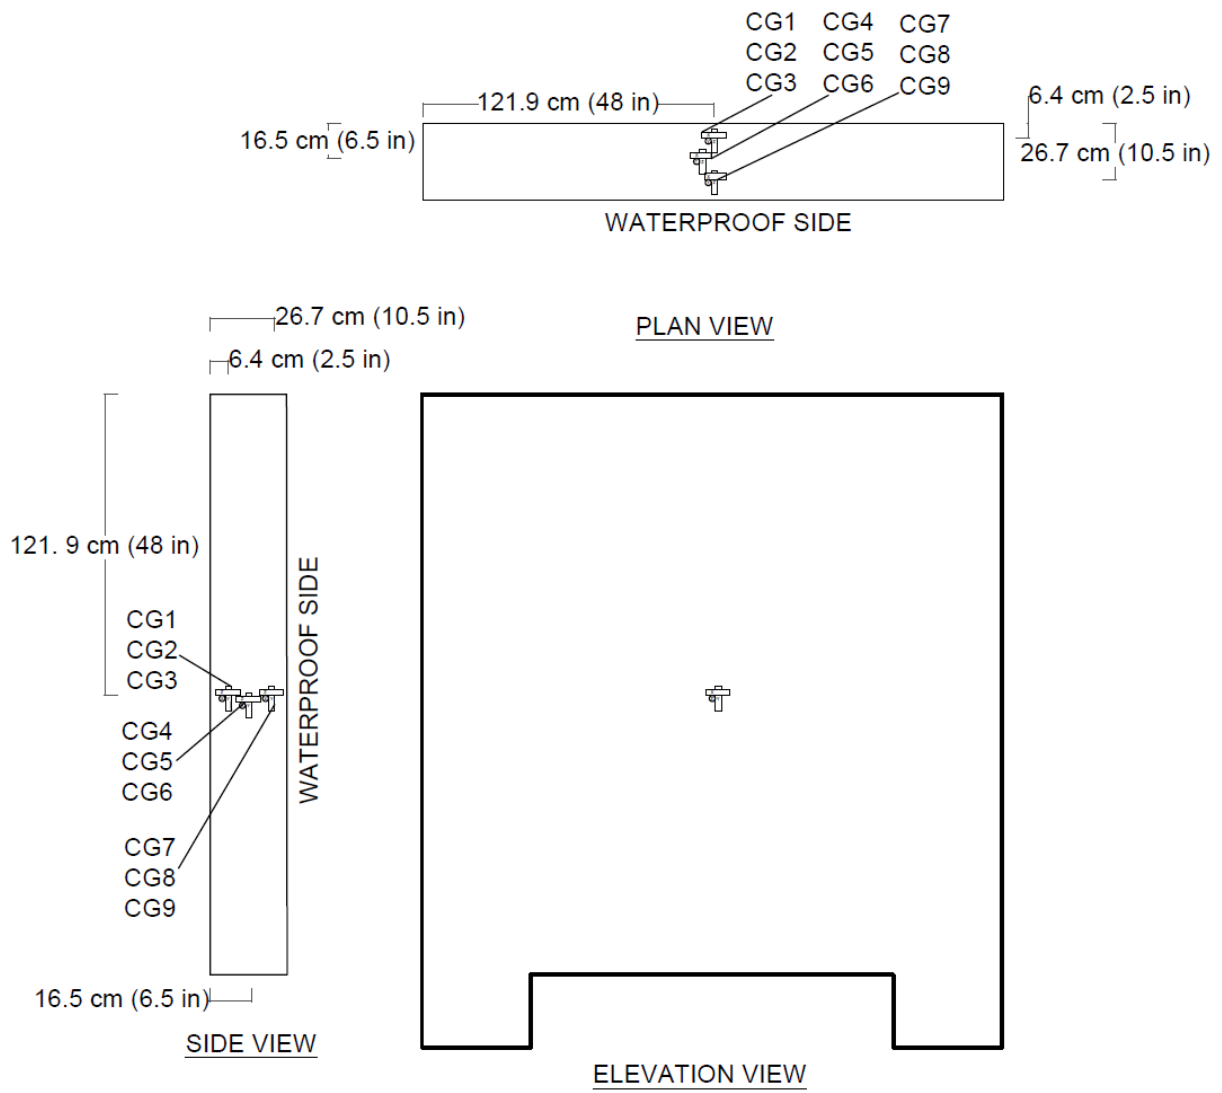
Specimen 1- Concrete Gage Labels and Locations
